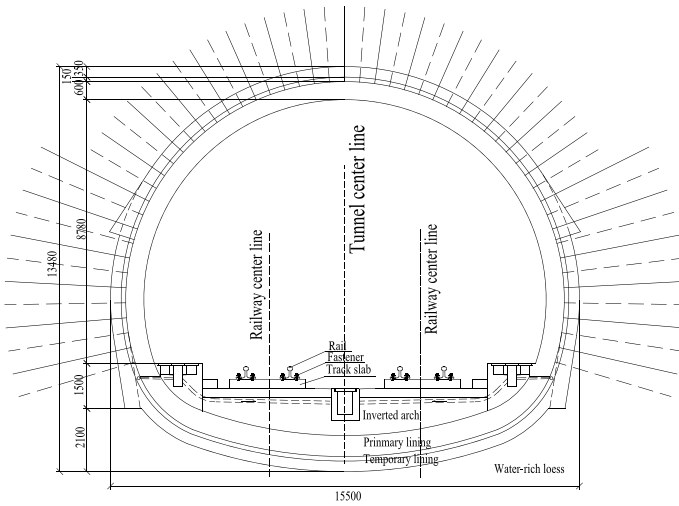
Cross section of Zhangmao Tunnel (unit mm)
